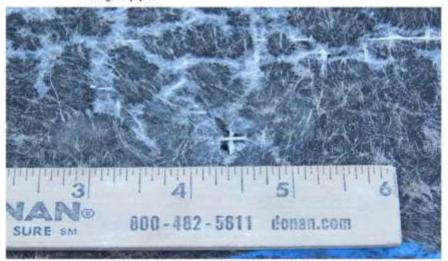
The modified bitumen roof outside of the copper-paneled, faux parapet walls is not painted.
